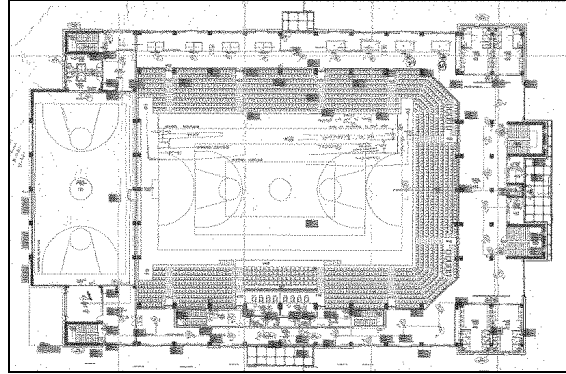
Mustafâ Dağıstanlı Sports Hall, 1st floor plan (Source: İremnur Öztürk et al., 2020)
